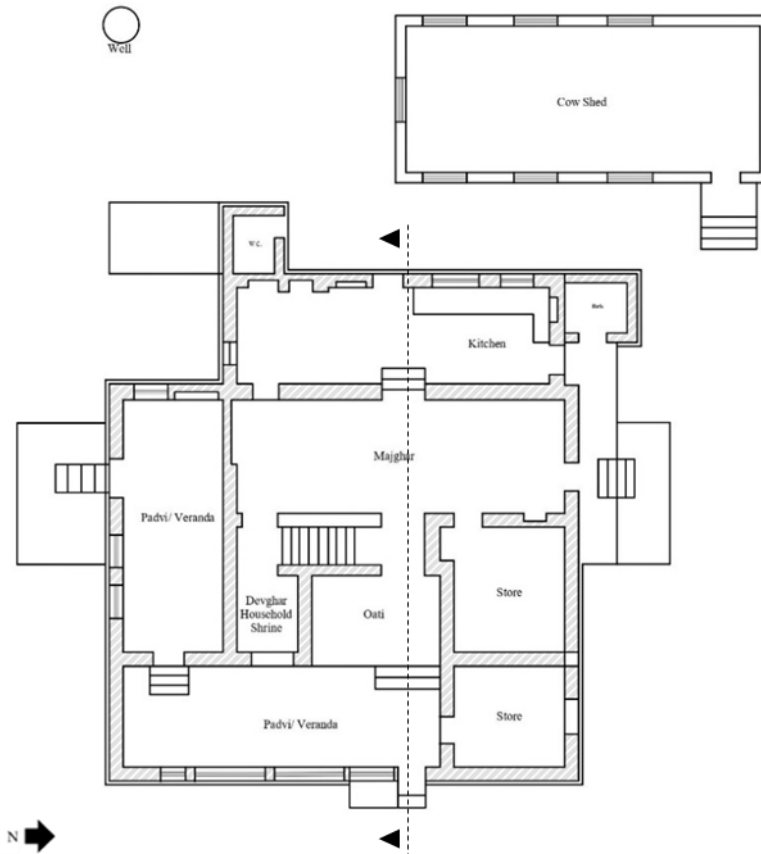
Ground Floor Plan of Paranjape House at Kelashi, Maharashtra, India
